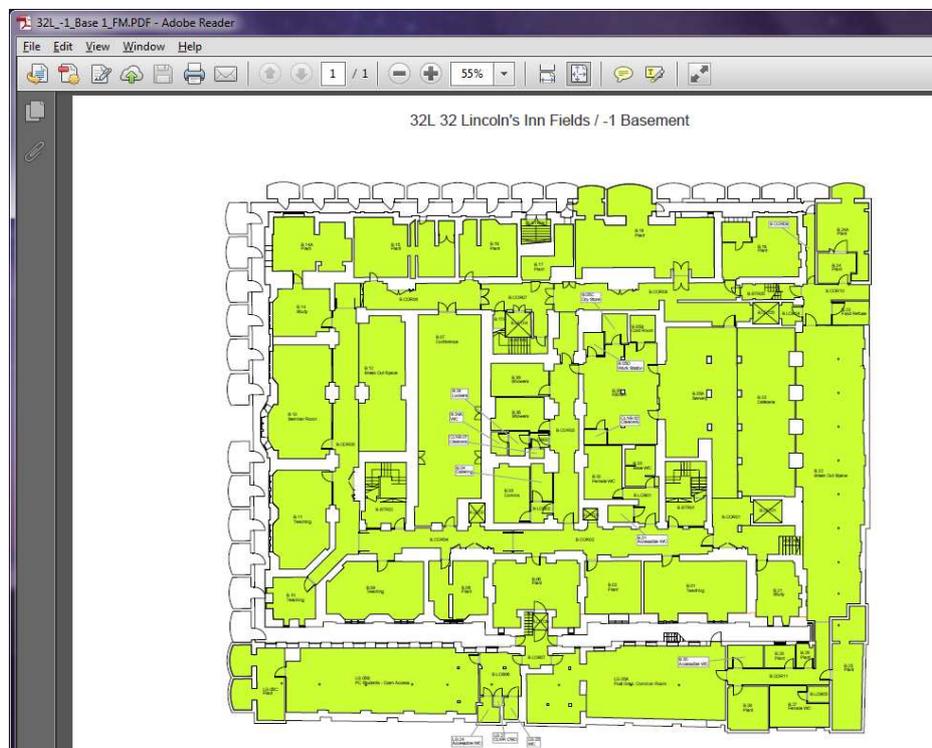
32L Basement floor plan seen on Adobe Reader
